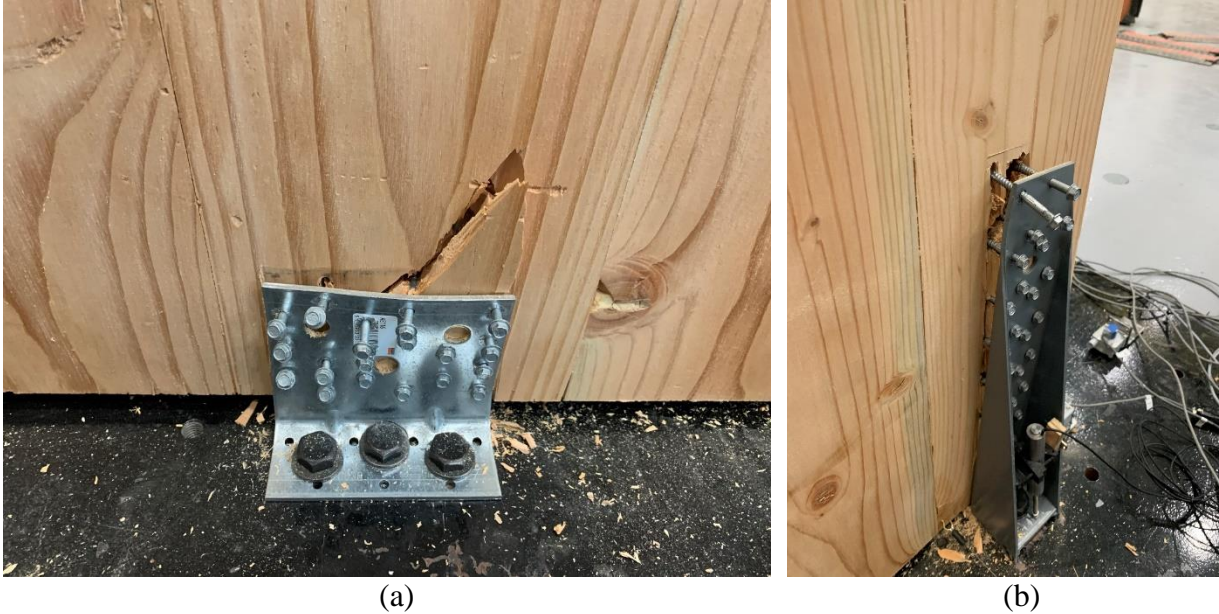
Test B5 Foundation Connection Damage (East Side)
